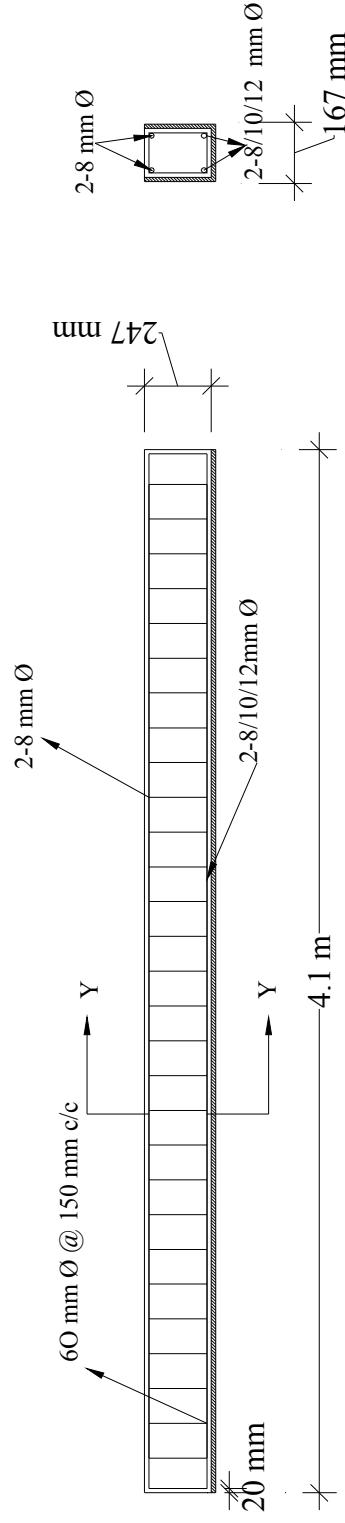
Longitudinal Cross-Section of Retrofitted Beam
